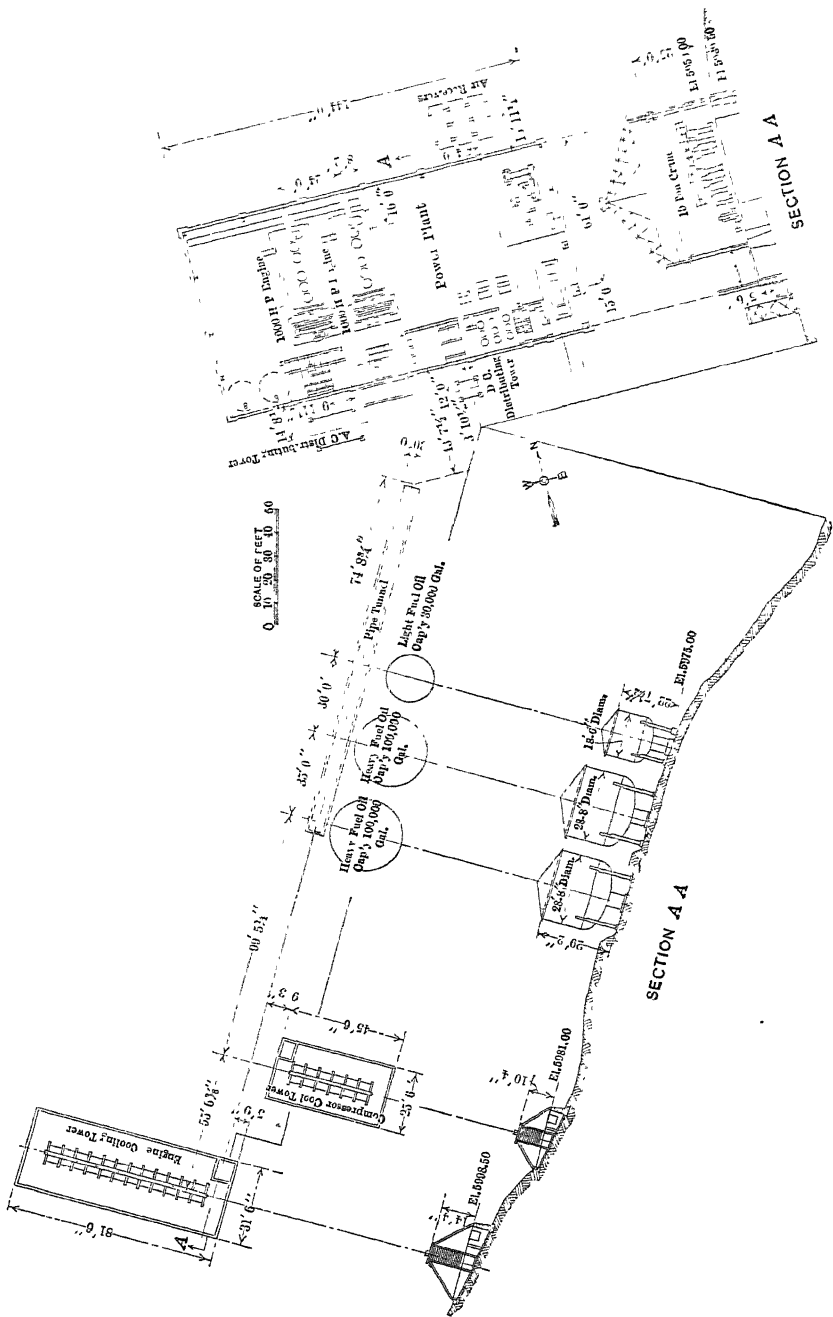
GENERAL ARRANGEMENT OF POWER PLANT EQUIPMENT, BURRO MT. COPPER CO., TYRONE, N. M.
